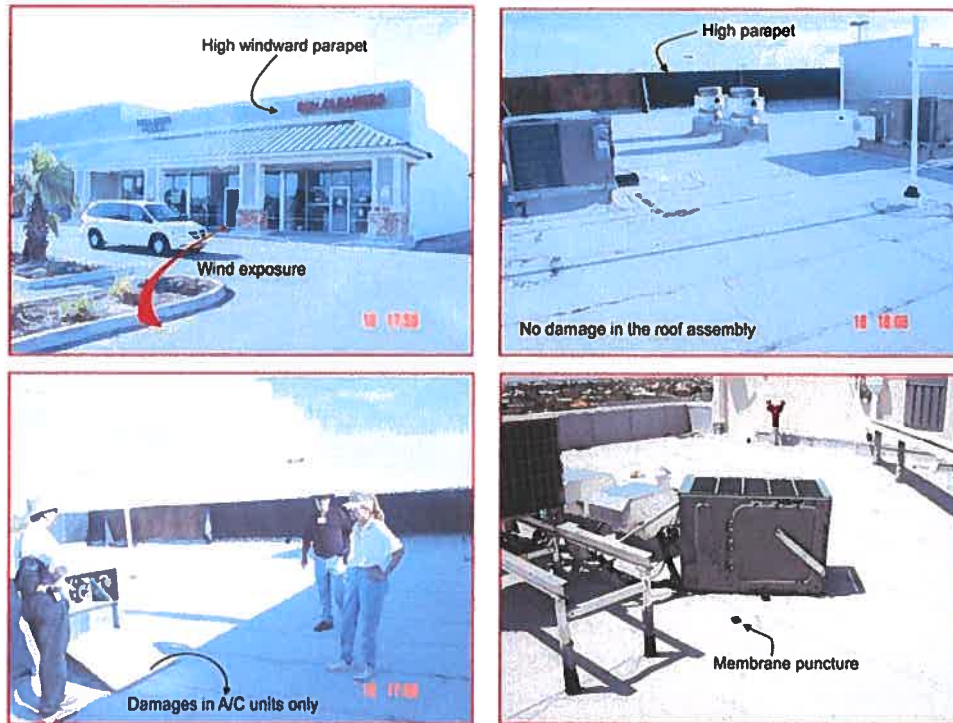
Survived roof assembly due to high parapet and damages caused by the rooftop equipments.
